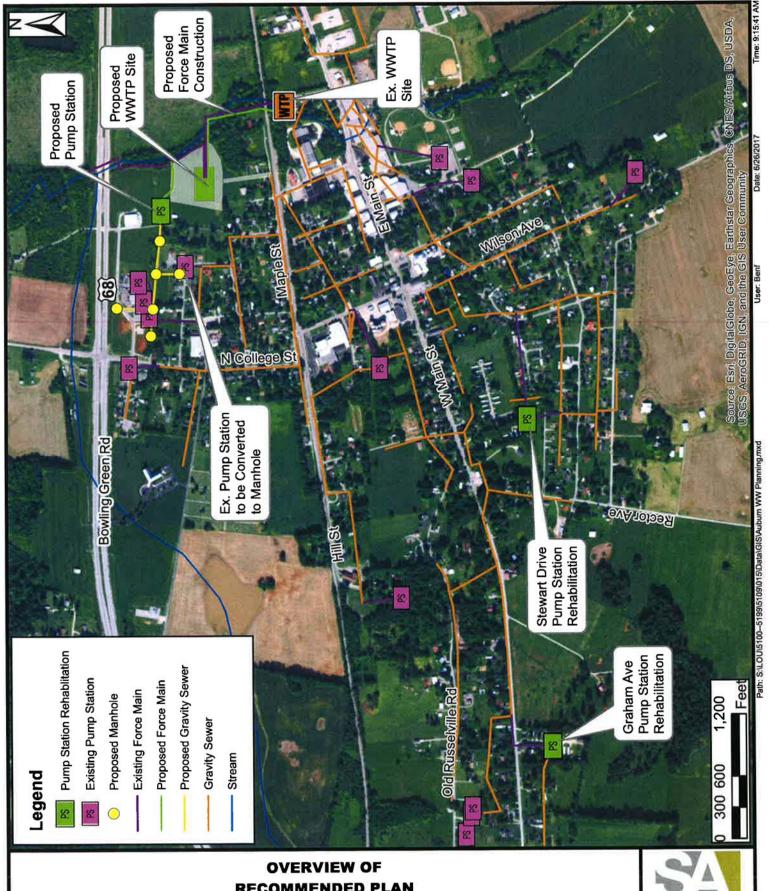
Auburn Wastewater Facilities Plan, Overview of Recommended Plan
